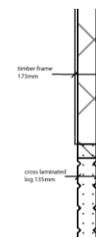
Detail of external wall between the two floors in the office building, Wands, n.d.
